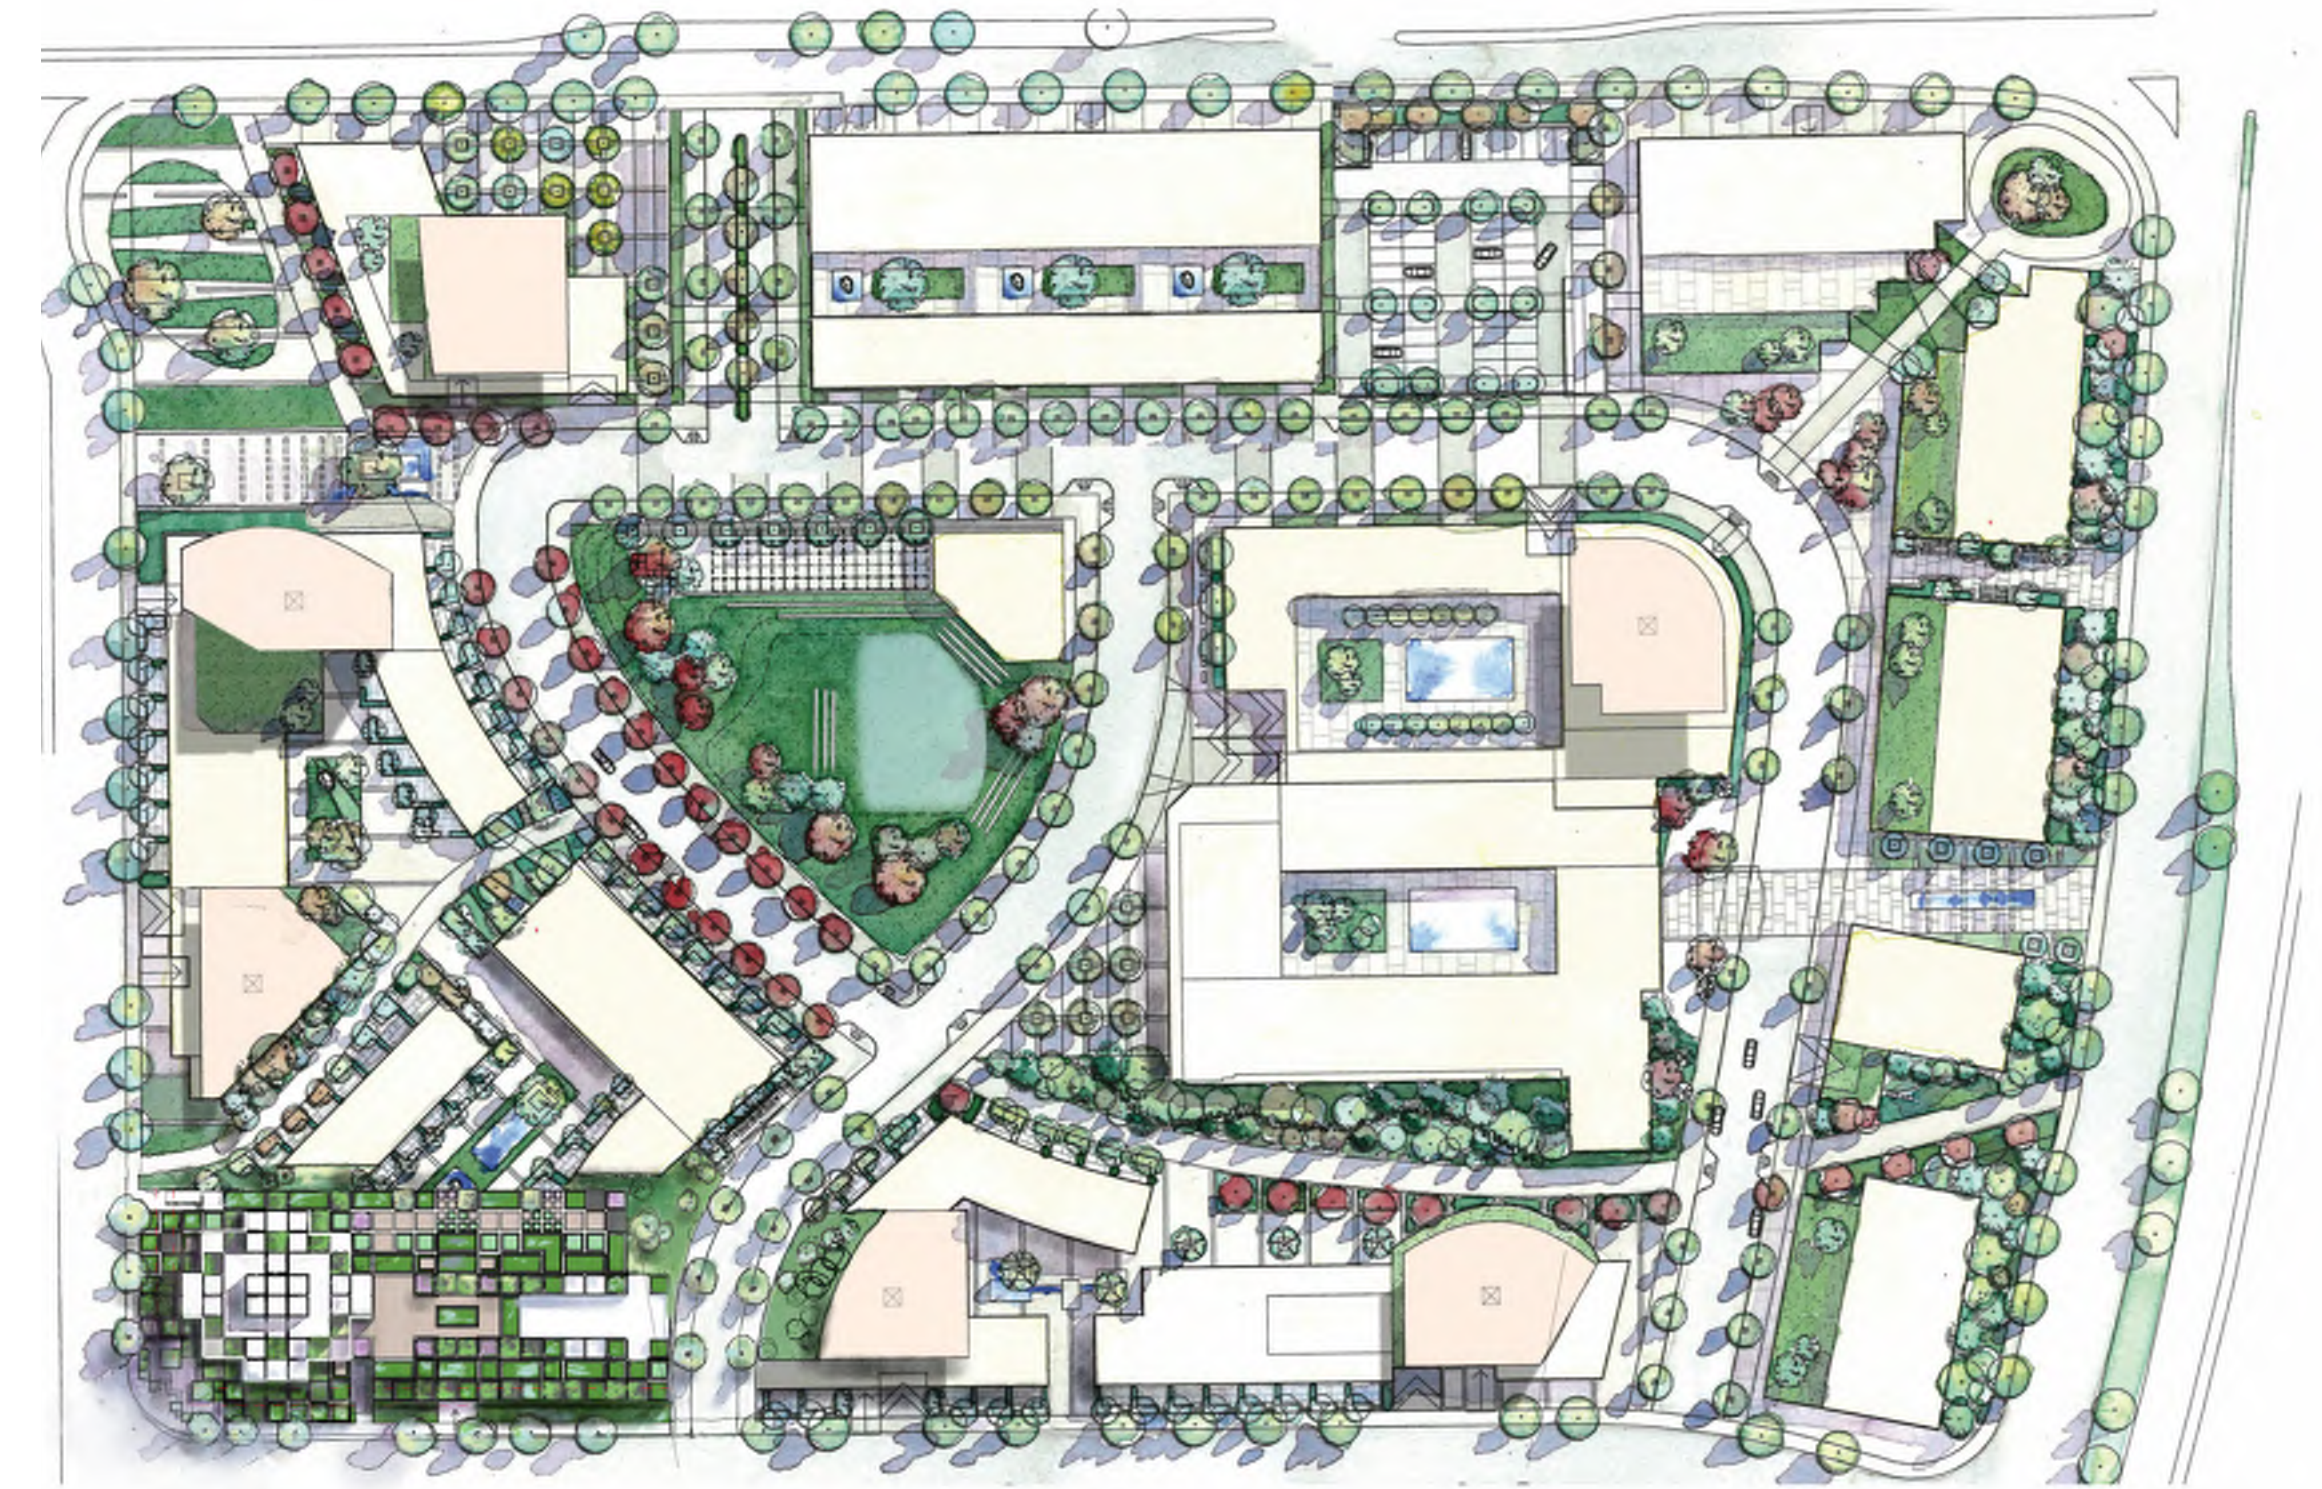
Capri Centre Concept Plan - Comprehensive Zone 26 - OCP 2040
